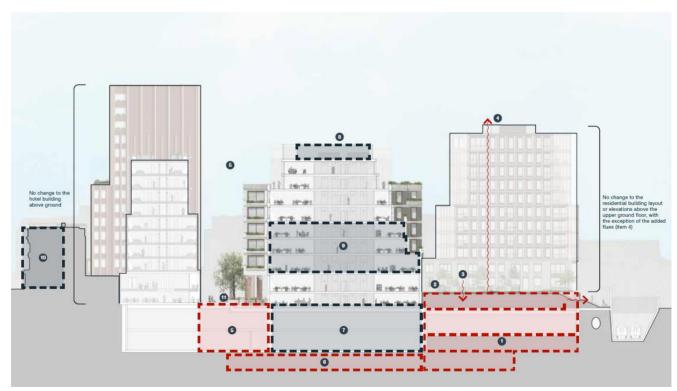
Section through development highlighting changes to Consented Scheme (Source: AHMM)
